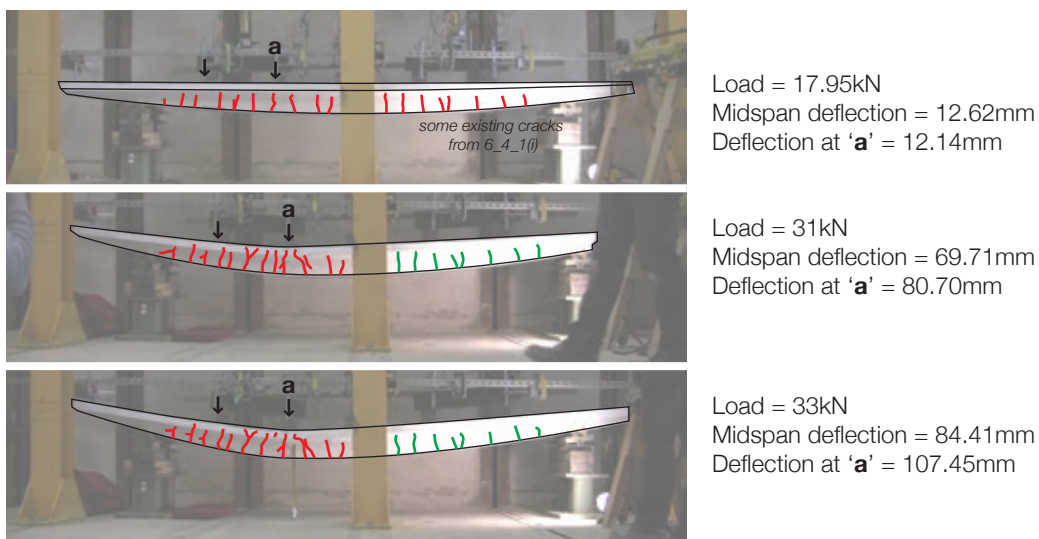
Beam 6\_4\_2(ii) crack locations and failure mode.
